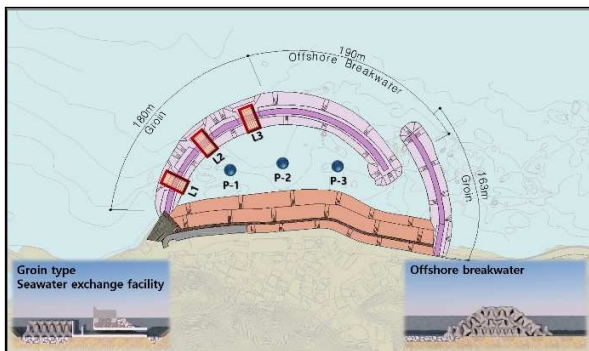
3D Layout Plan for Seawater Exchange Structure
